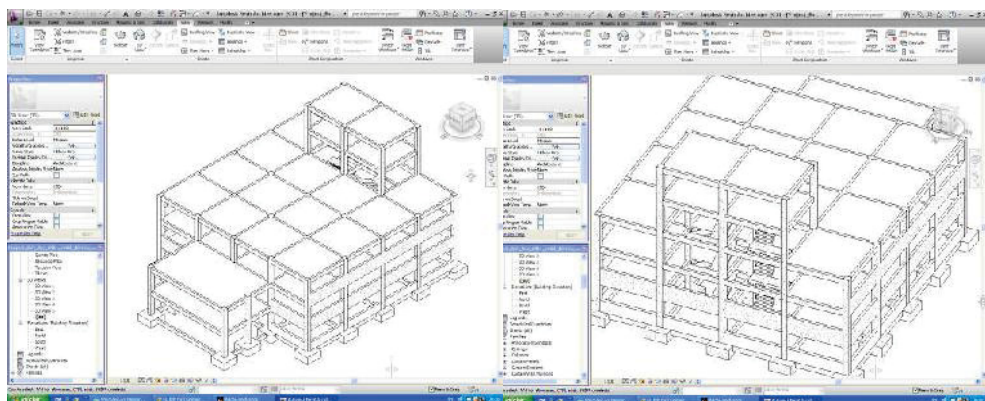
Revit Architecture 2011 – Reinforced Concrete Structural Model
